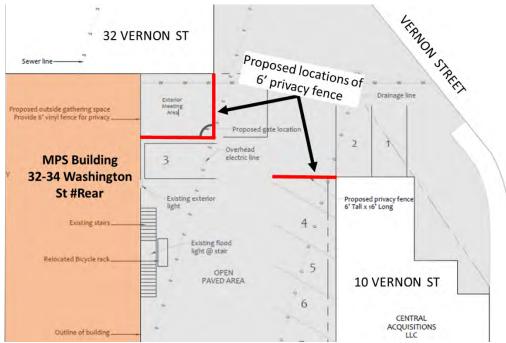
Excerpted image from the proposed plan with the paved area shaded in gray, the MPS building shaded in orange, and the proposed locations of the vinyl privacy fence outlined in red.
